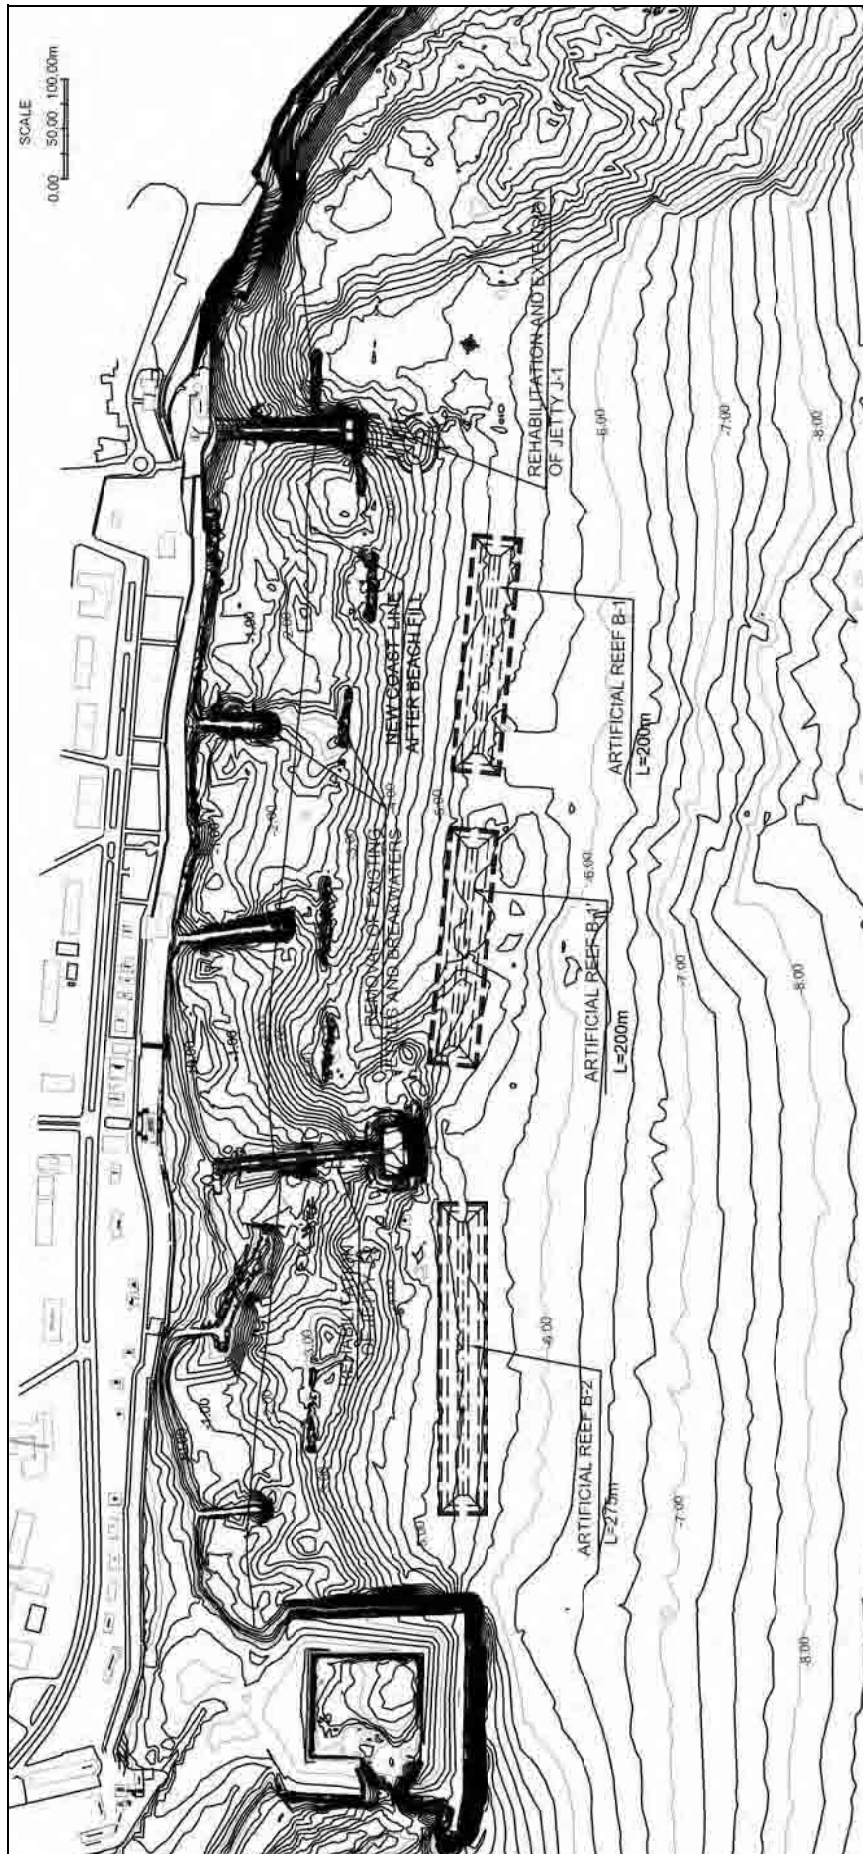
General layout of shore protection facilities at Eforie Nord
